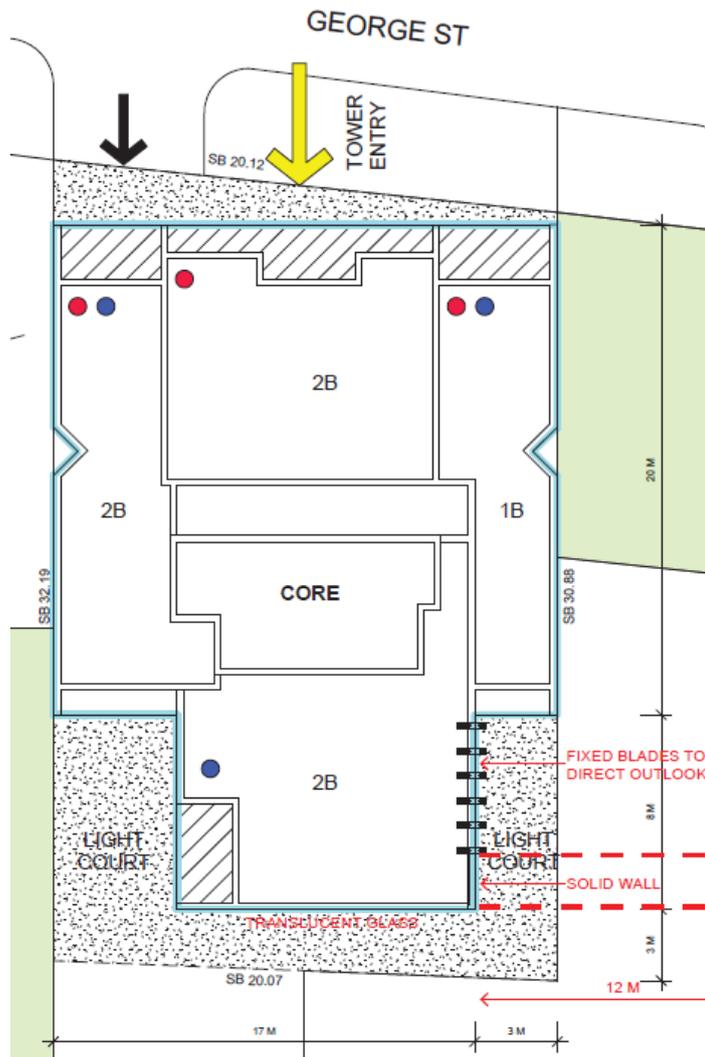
Built form permissible under PLEP 2011 and PDCP 2011 (Source: Applicant’s Urban Design Report)
